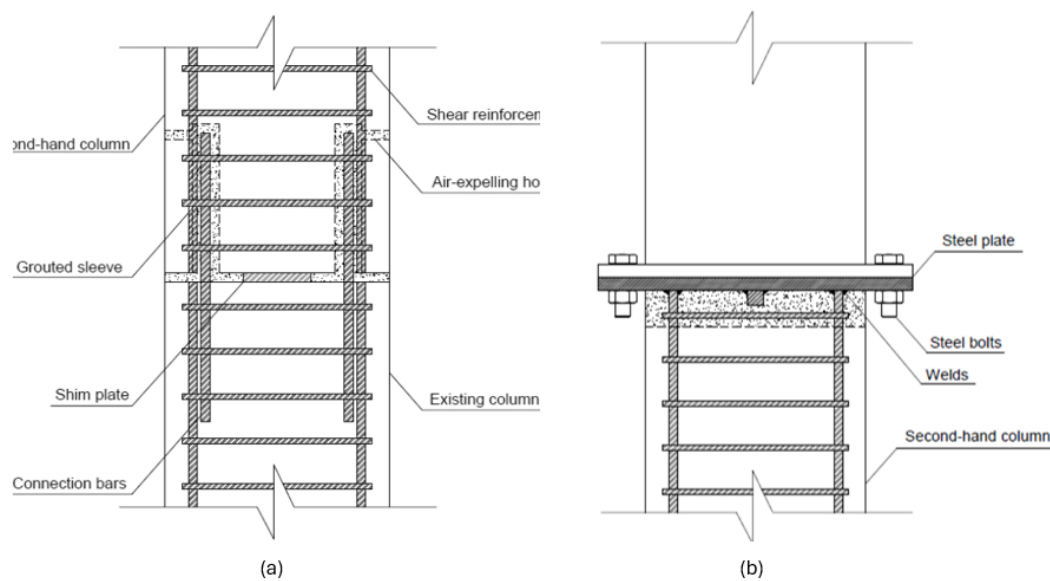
Design proposals for reconnecting a reused column to new column with a splice joint (Volkov, 2019)
